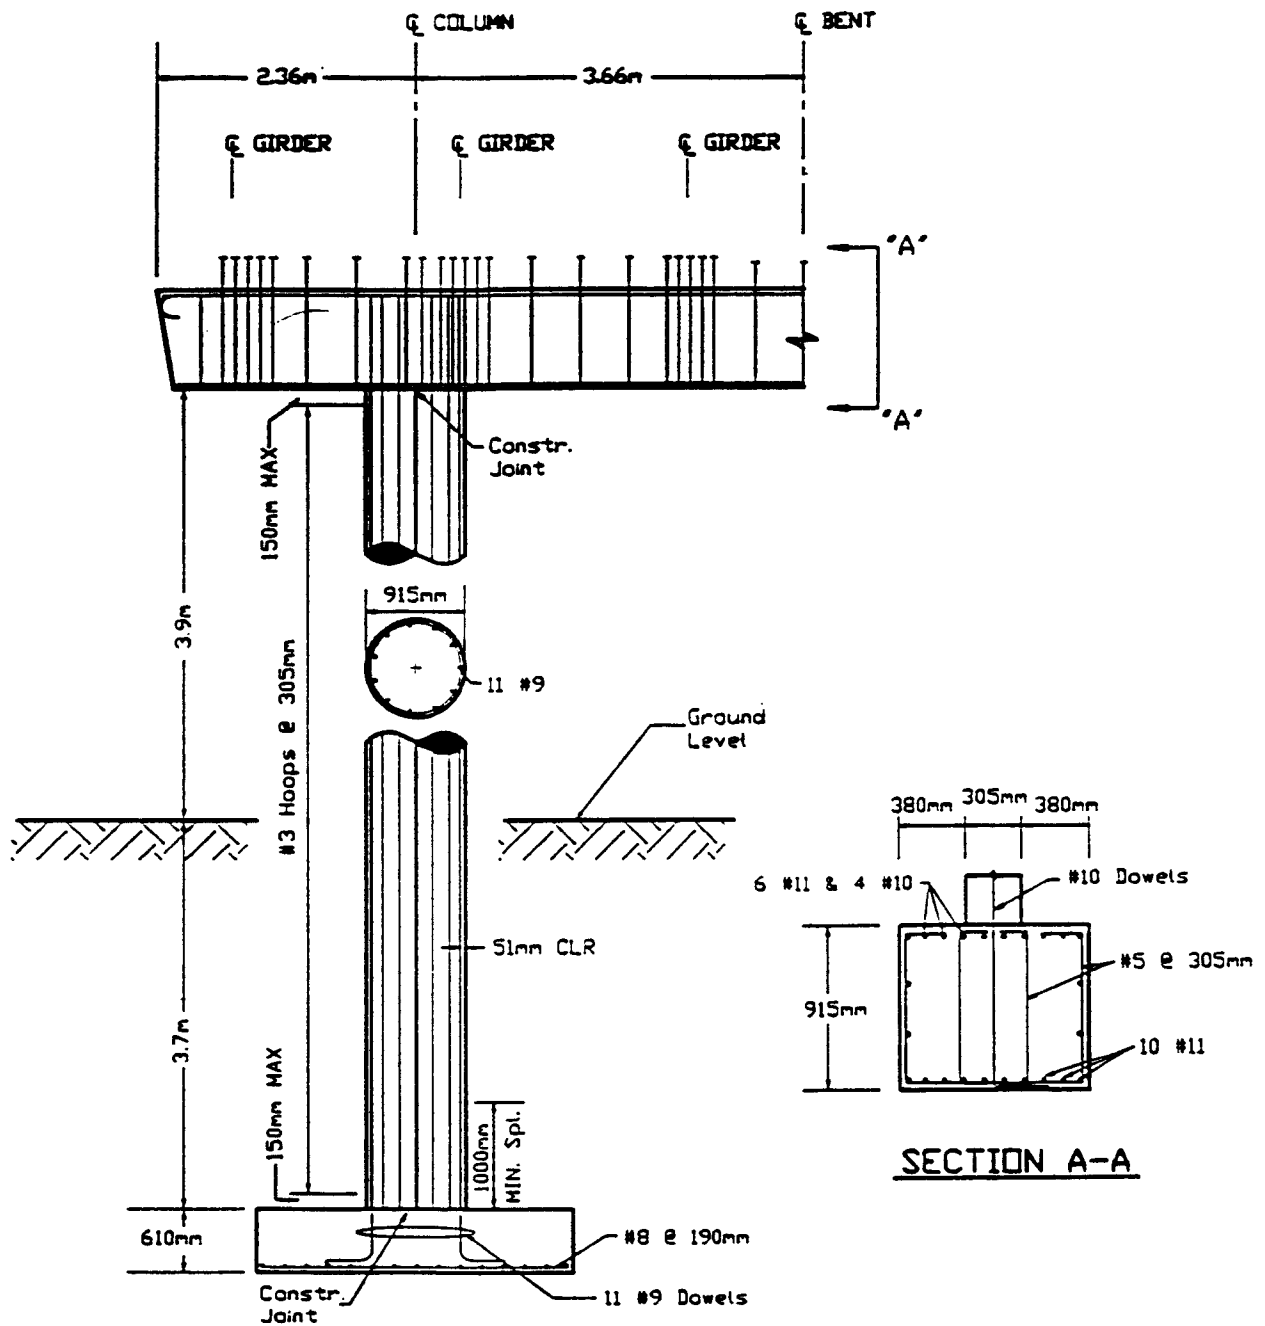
Bent Elevation and Detailing (Eberhard and Marsh, 1995, in review)
